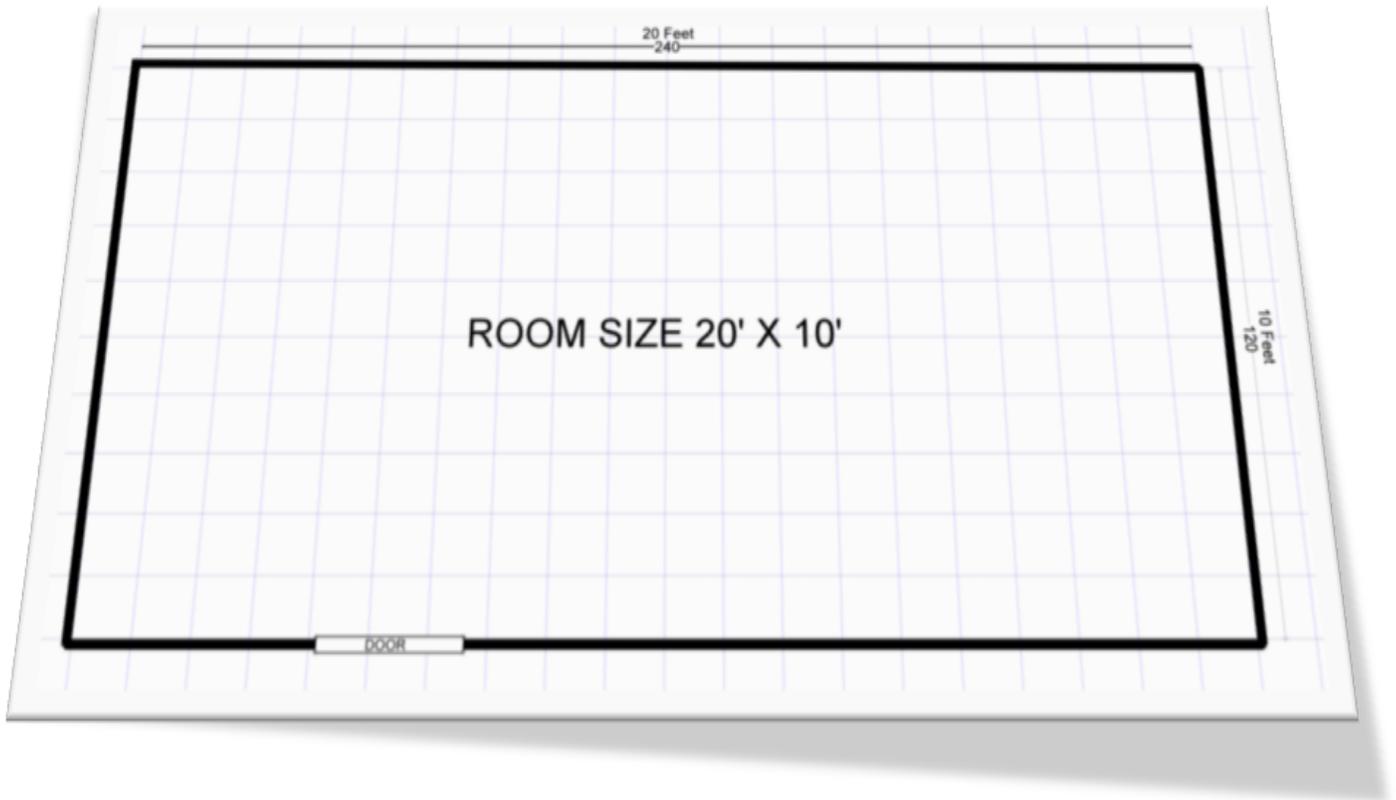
A typical 20' x 10' area where a shelf layout would traditionally be built. The door is on the south wall.
